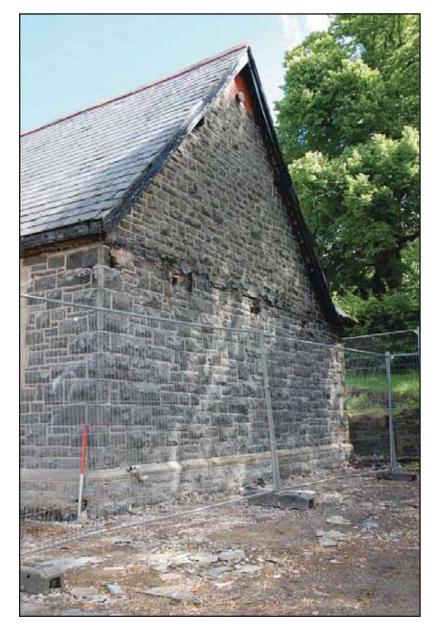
School Bank Road south building south facing elevation- exterior of room G01, detail of construction. Scale: 1.0m
